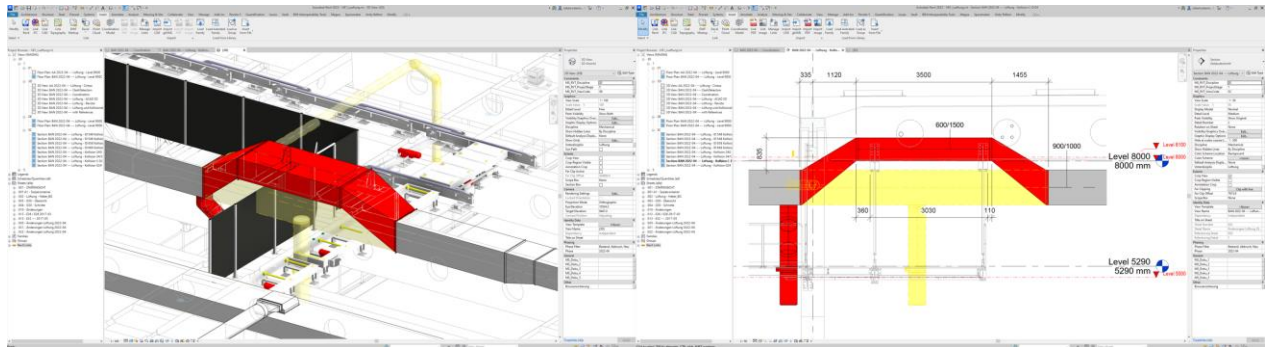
REVIT CLOUD MODEL SHOWING HVAC DESIGN
